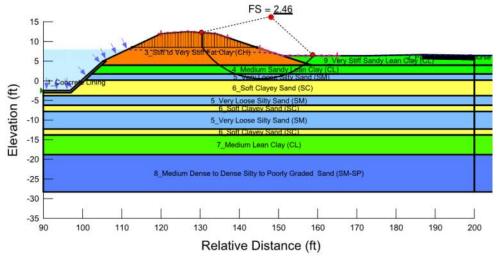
Steady State Seepage Stability Result (Cross Section BB)
